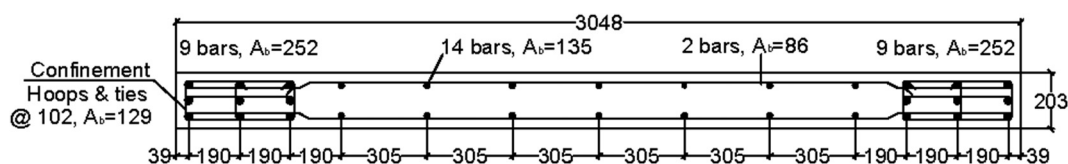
Typical planar wall characteristics (unit: mm; A_b : cross-section area of one steel bar).
